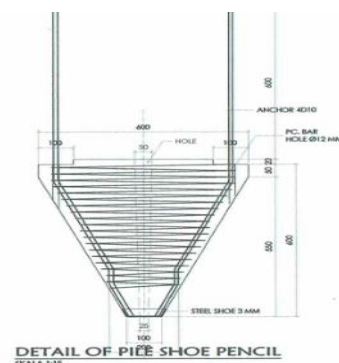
Detail of Pile Shoe Pencil (Source: Shop Drawing)
